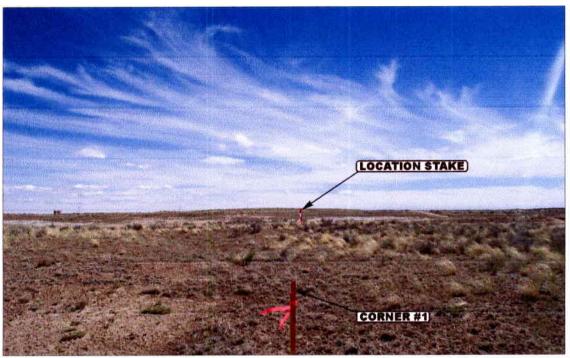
PHOTO: VIEW FROM CORNER #1 TO LOCATION STAKE
